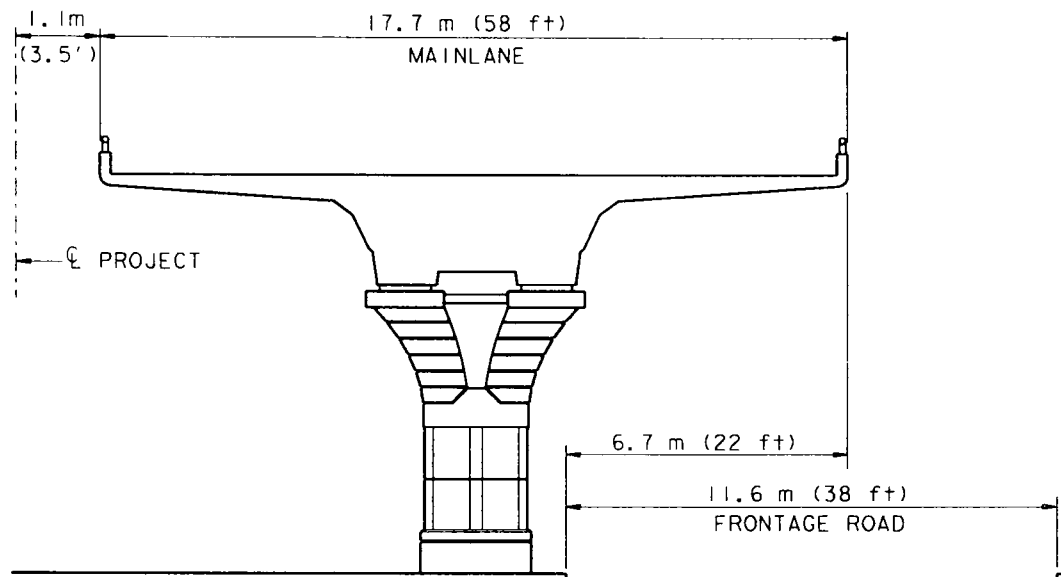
Mainline column and superstructure adjacent to frontage road.
